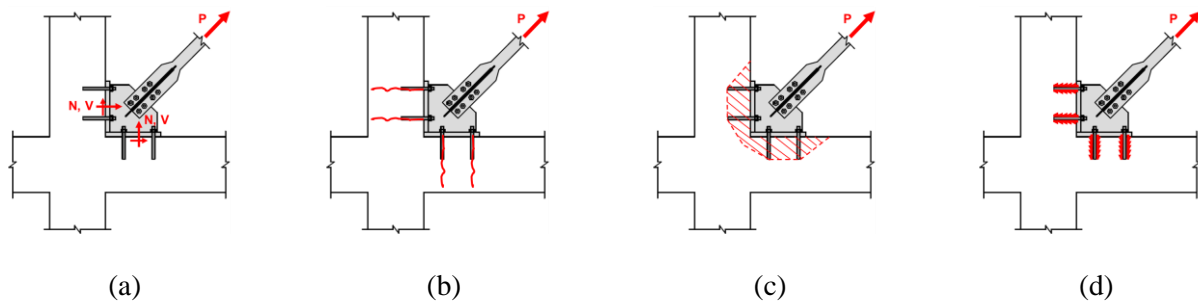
Challenges of direct connections (a) combined tension and shear load, (b) cracked concrete (c) influence of neighboring anchor group and (d) limited dimensions
